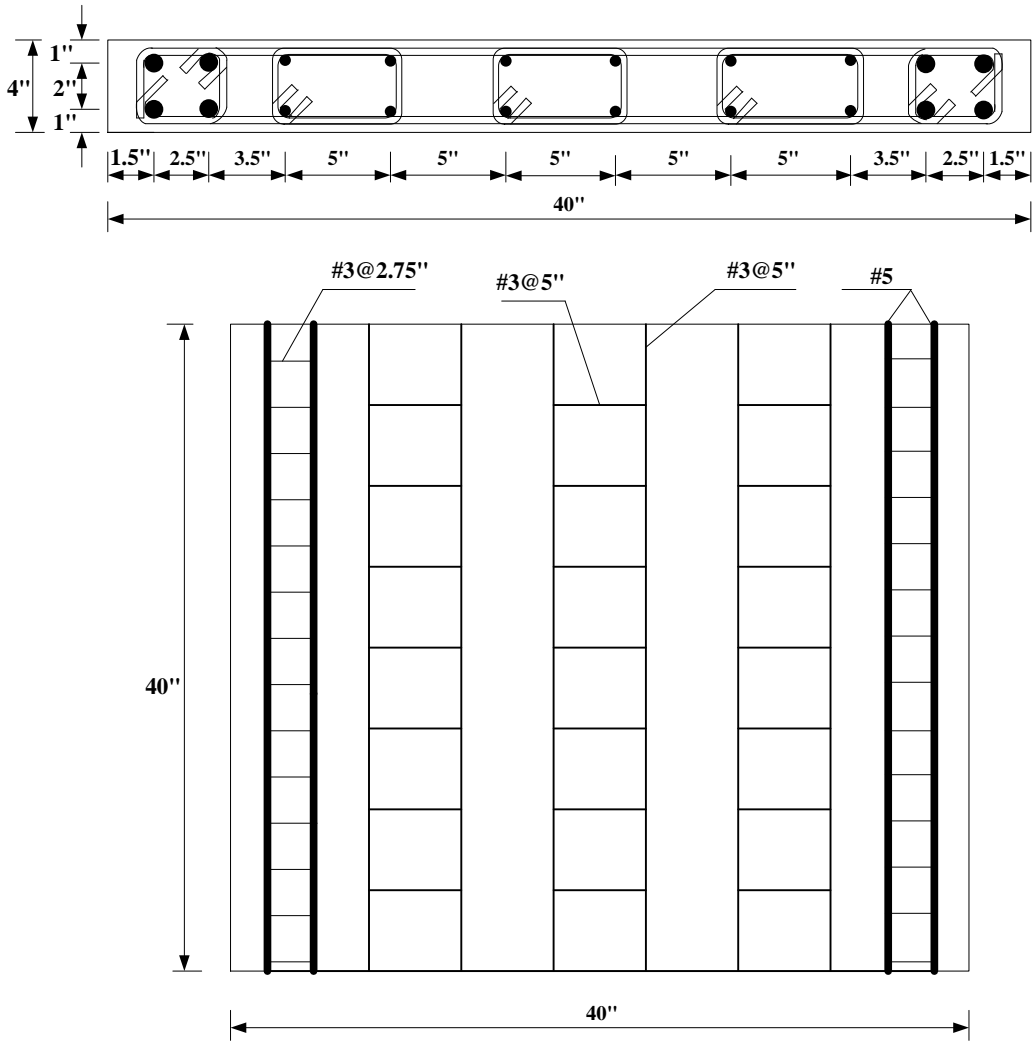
Reinforcement layout for specimen SW-MP-1.0-1
